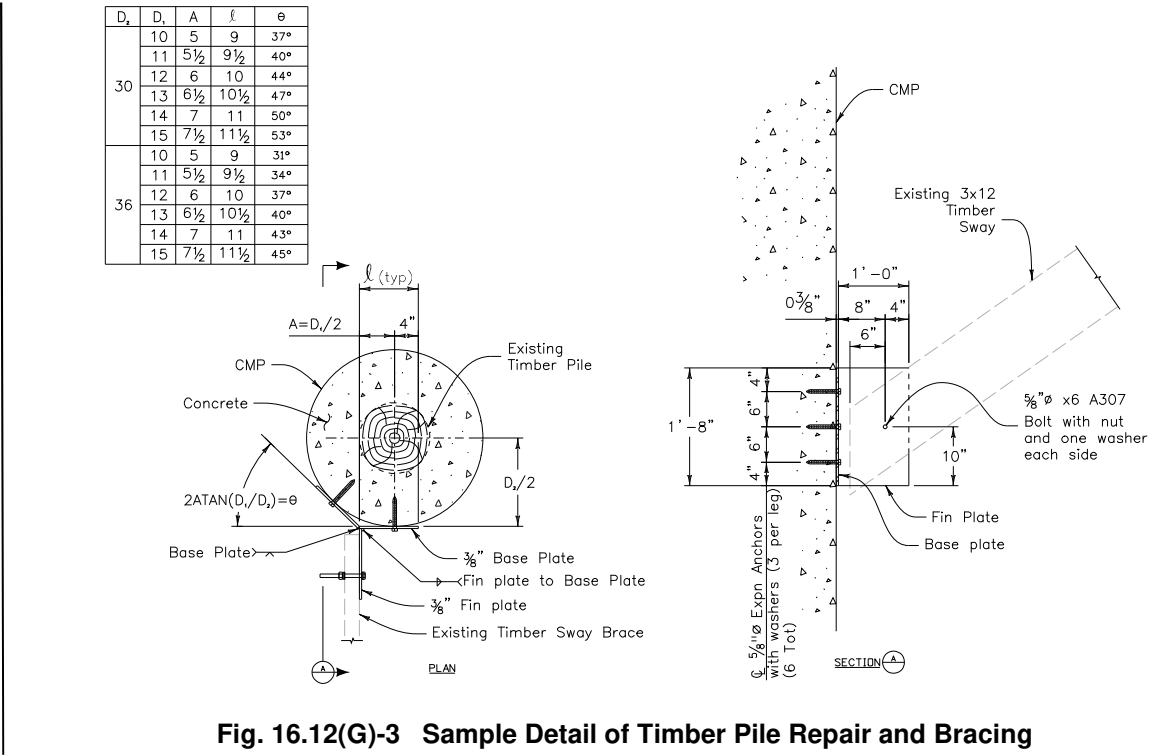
(G)-3 Sample Detail of Timber Pile Repair and Bracing
